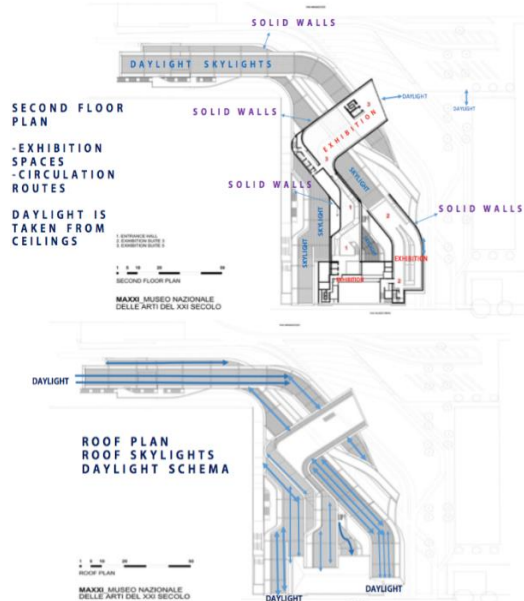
Drawings; plans; second and roof floor plans, daylight analysis
